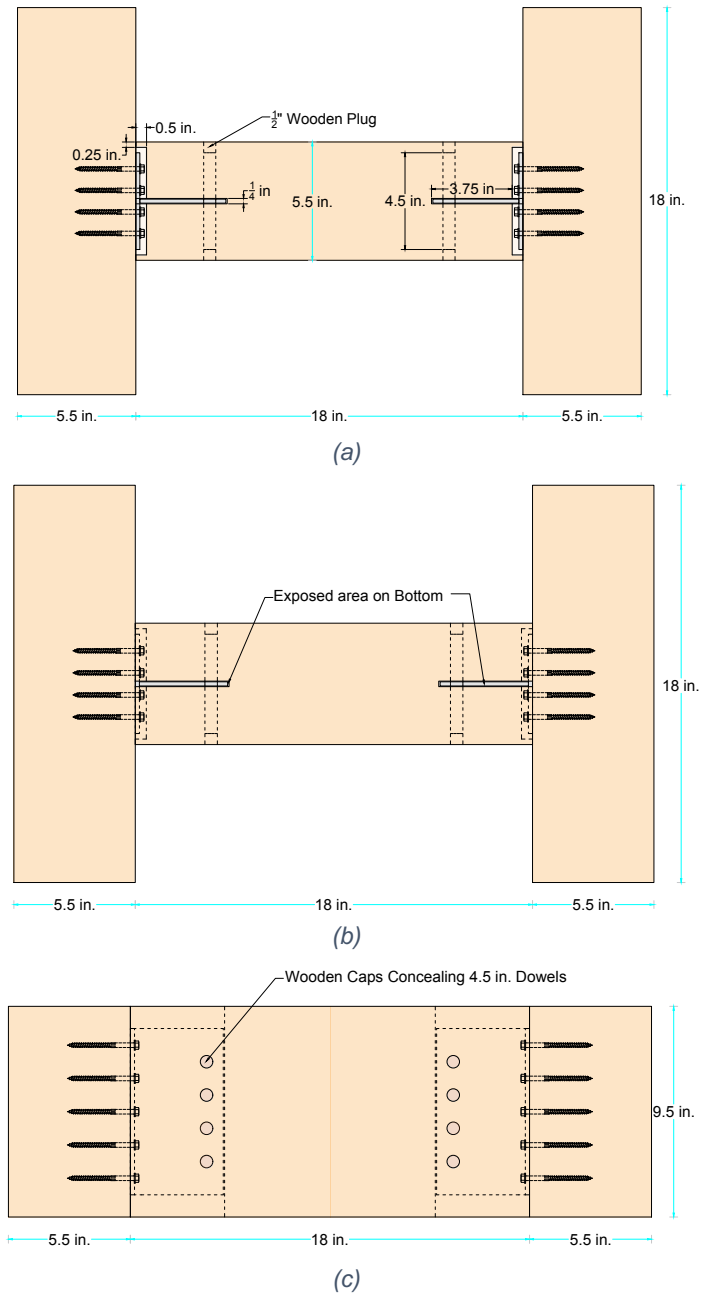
Beam-to-girder assembly: (a) top view, (b) bottom view, (c) front view.
